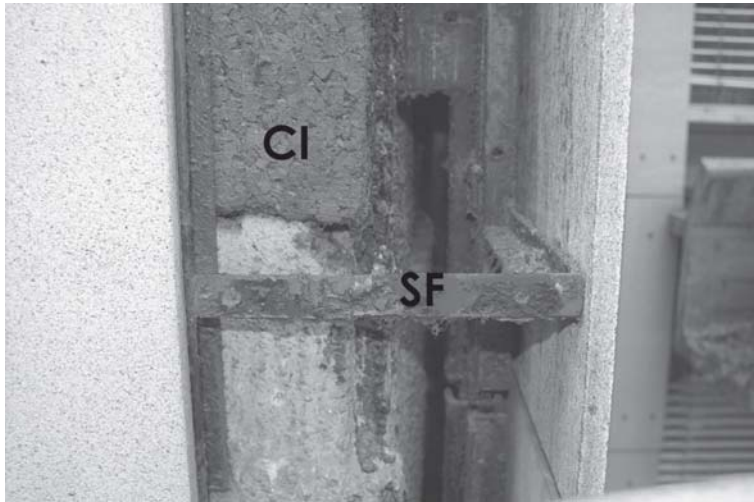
Construction of the façade. The slabs are fixed onto a steel frame (SF). The concrete structure is covered by cork isolation (CI)
